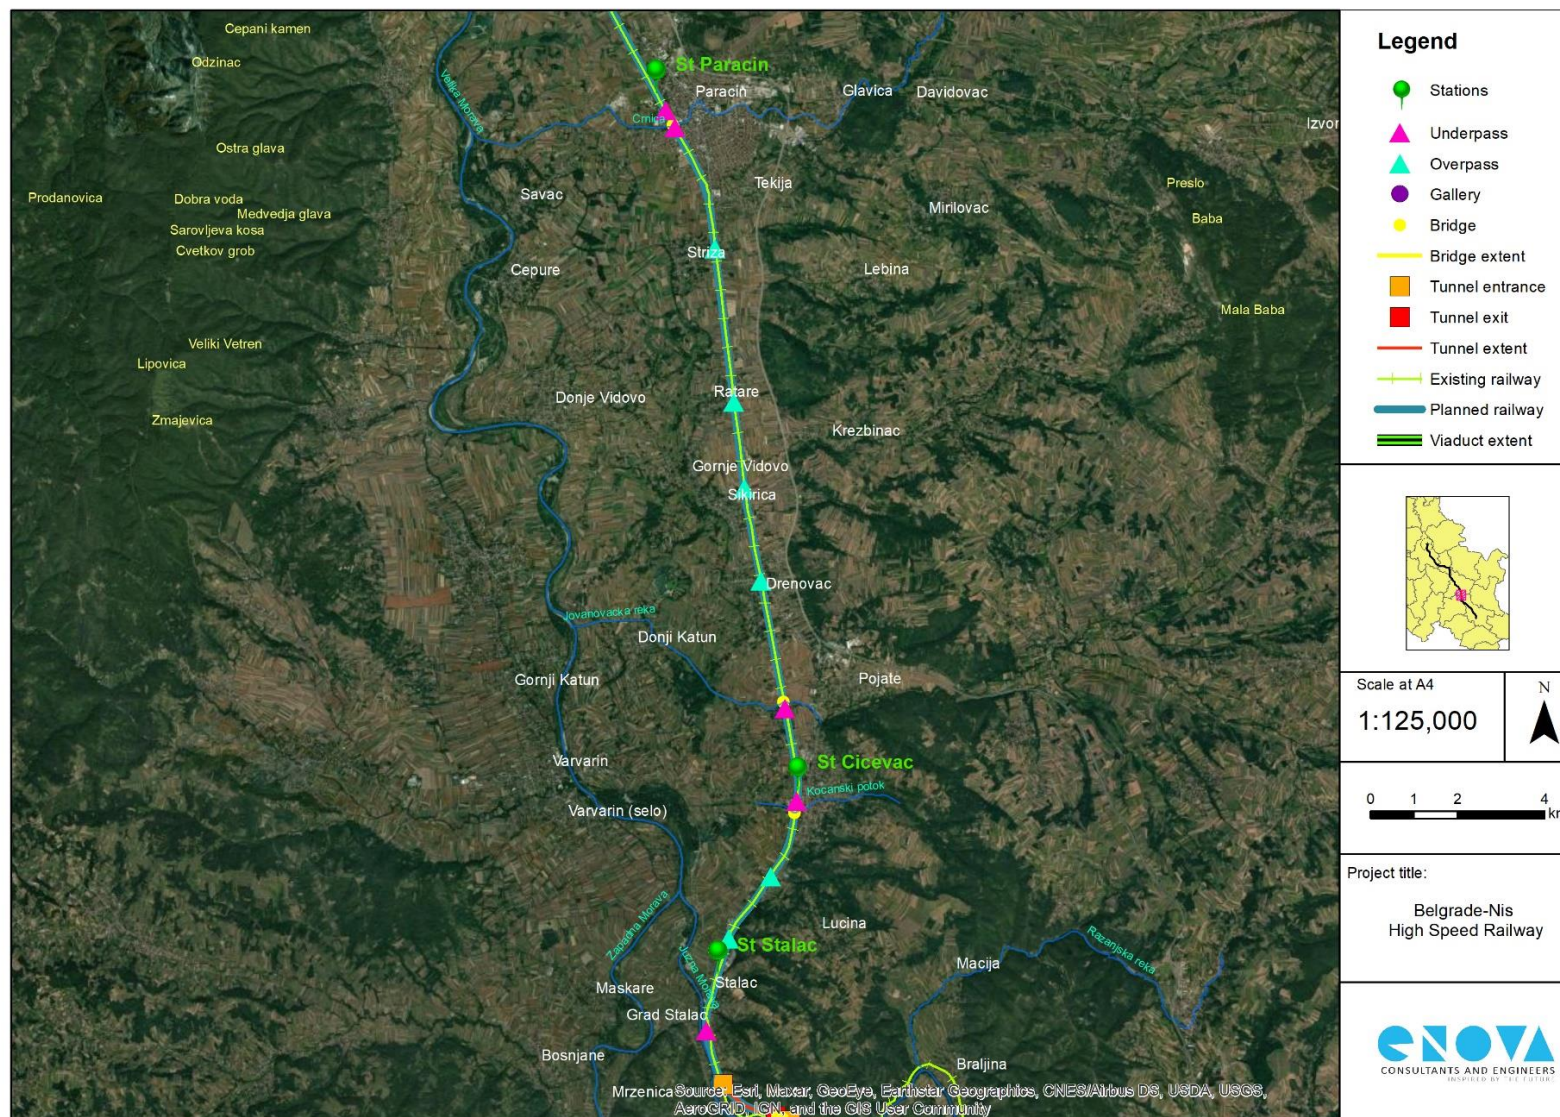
Existing and planned railway with ancillary structures (Paracin-Stalac subsection)
